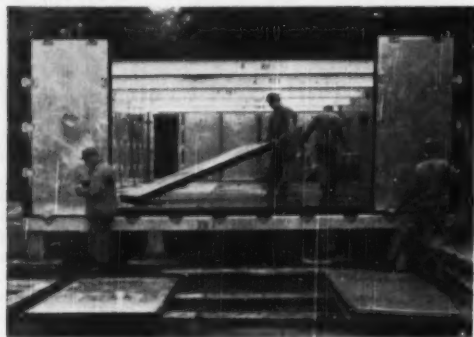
PREFABRICATED ALUMINUM ARMY TROOP BUILDING IN PROCESS OF CONSTRUCTION SHOWING SIDES AND ONE END COMPLETE, AND CEILING JOISTS IN PLACE
